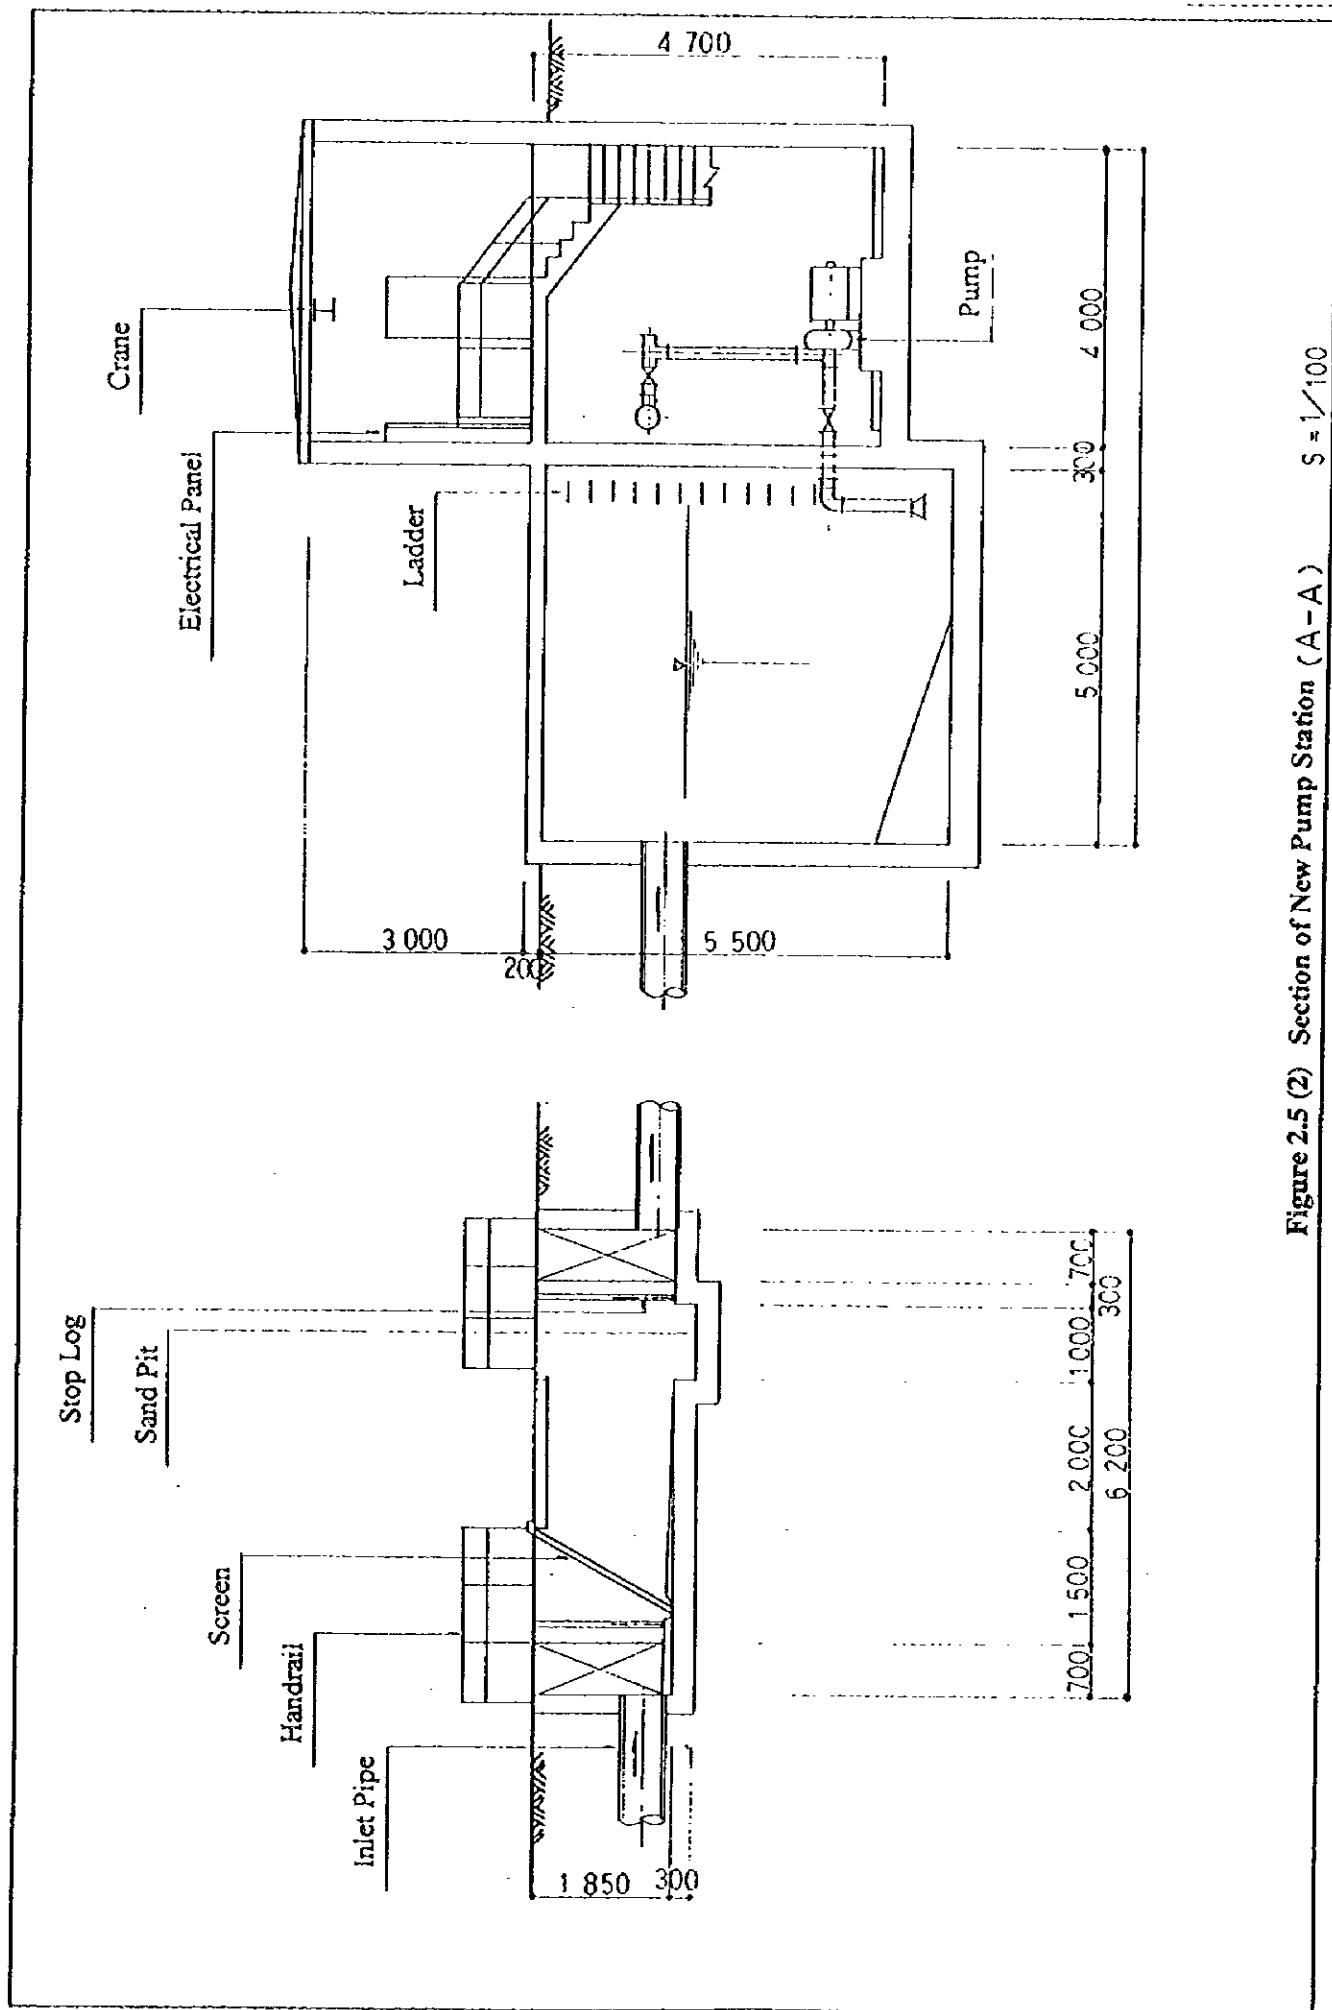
(2) Section of New Pump Station (A-A) $S = 1/100$
